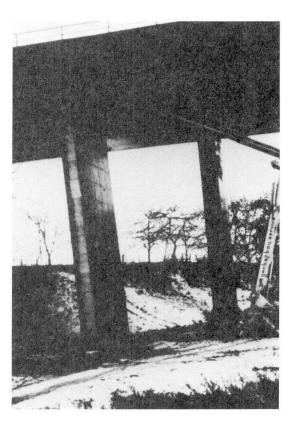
Damage to the pier due to rolled off bearing (valley bridge Blockheide
